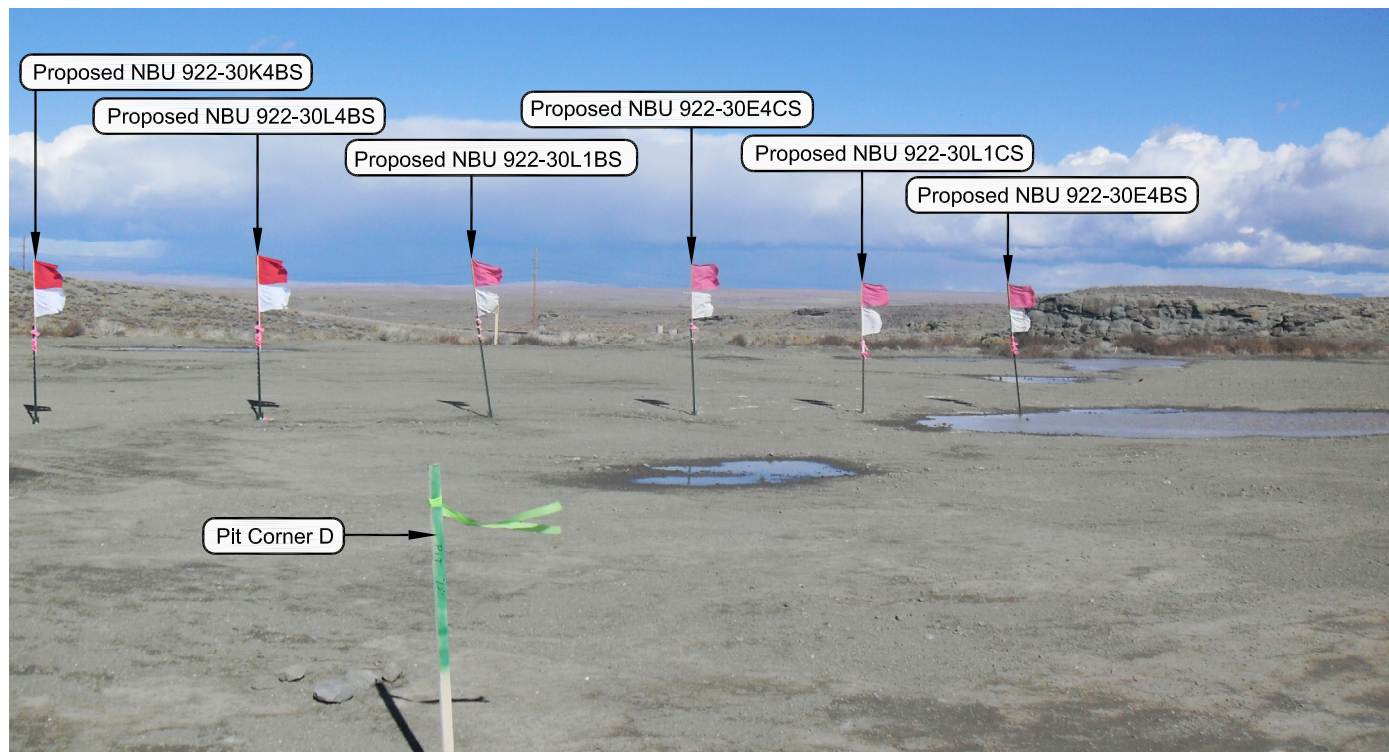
PHOTO VIEW: FROM PIT CORNER D TO LOCATION STAKE
